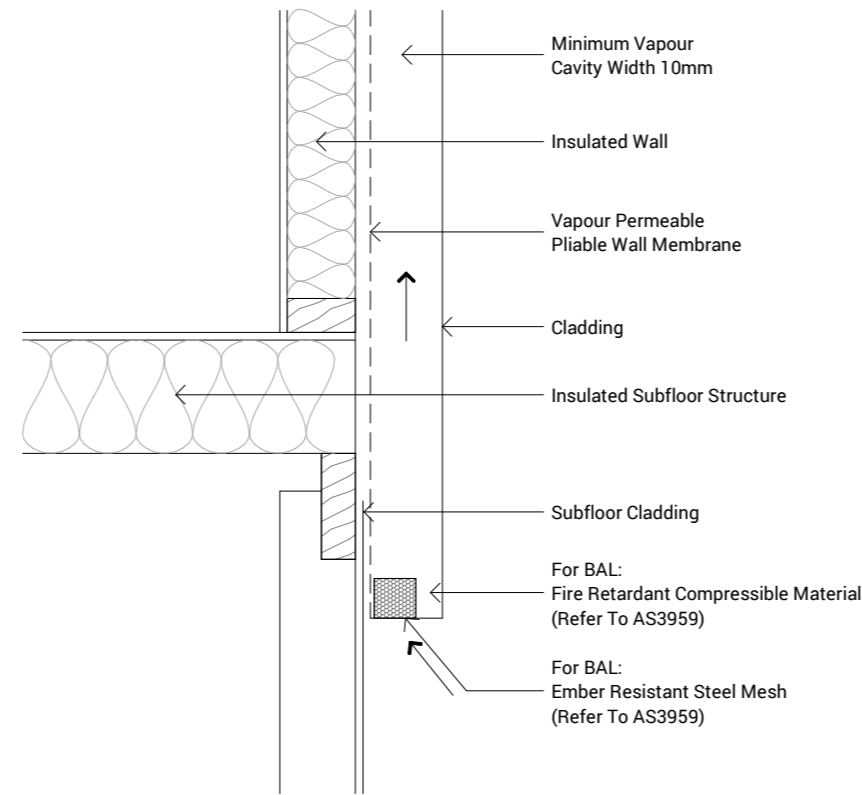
SUSPENDED TIMBER FLOOR WITH VERTICAL BATTENS
